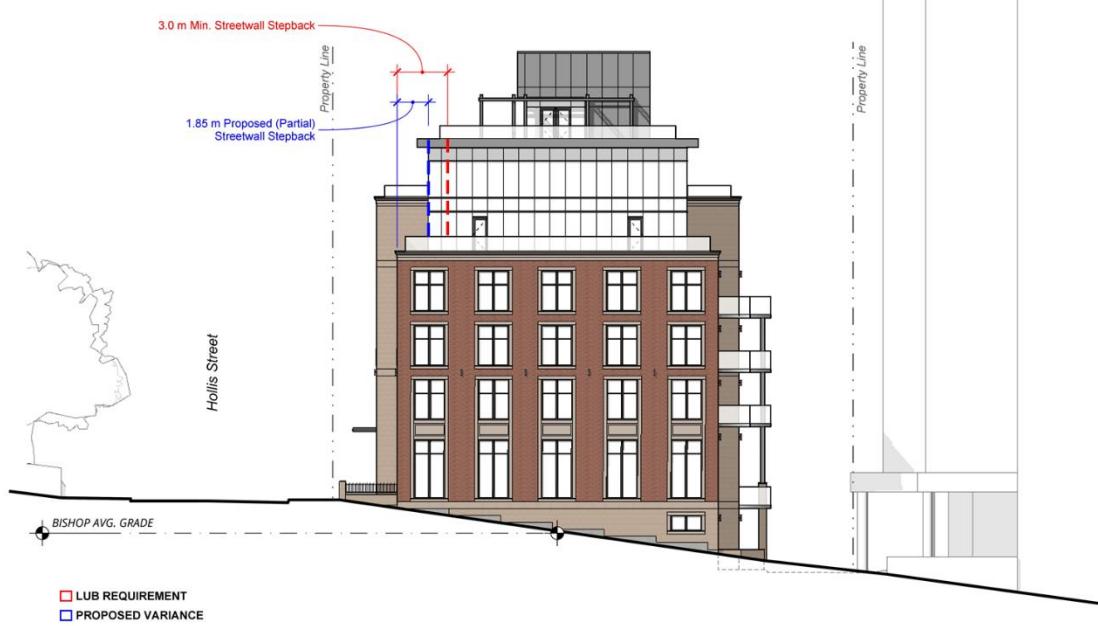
South elevation illustrating requested variance of upper streetwall stepback on Hollis Street to 1.85m
